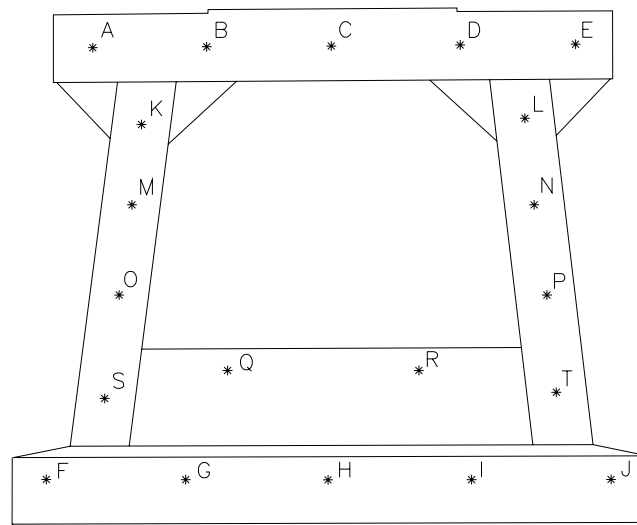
Typical UPV and Half Cell testing locations on the single frame bents.
